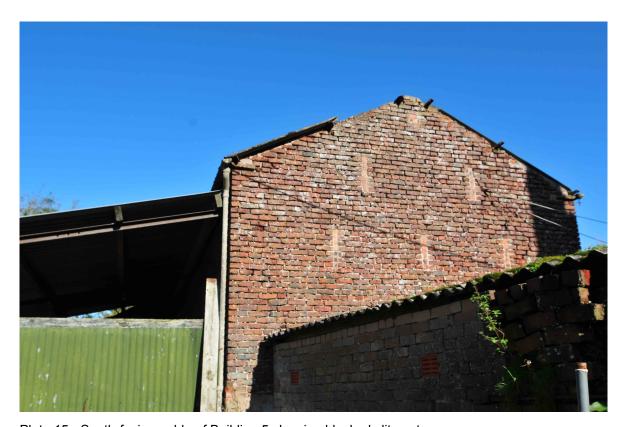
South-facing gable of Building 5 showing blocked slit vents
